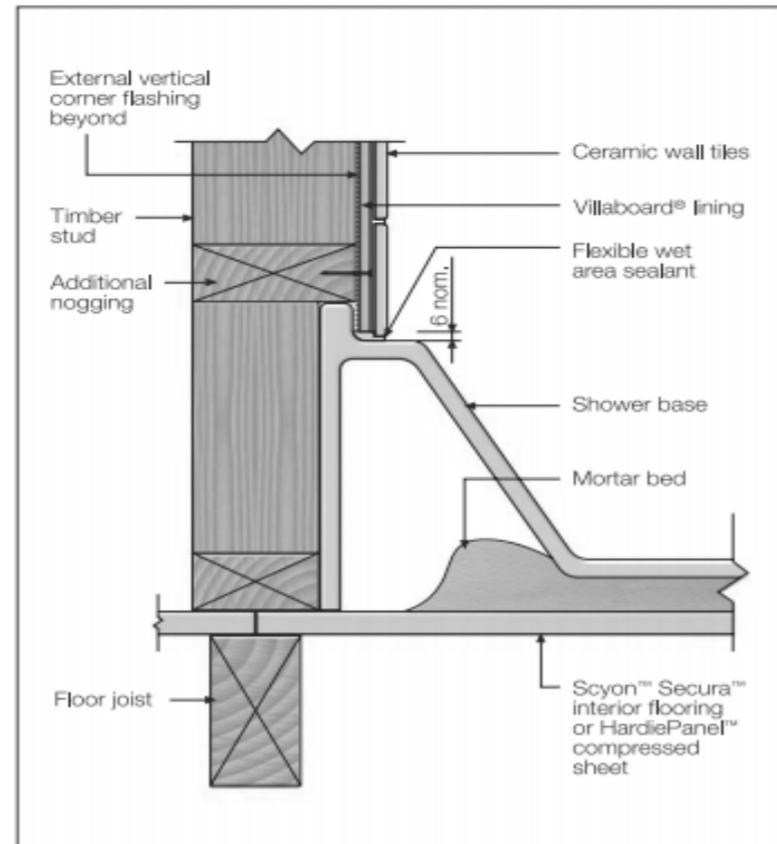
PREFORMED TRAY DETAIL FOR VILLABOARD LINING TO BE TILED
